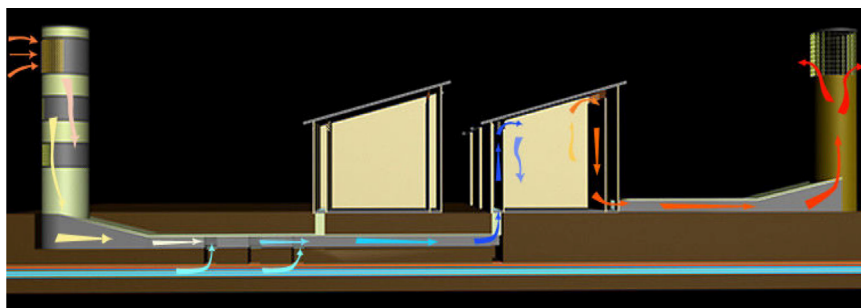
Air moves in a building through wind tower, underground canal and solar chimney [50].
